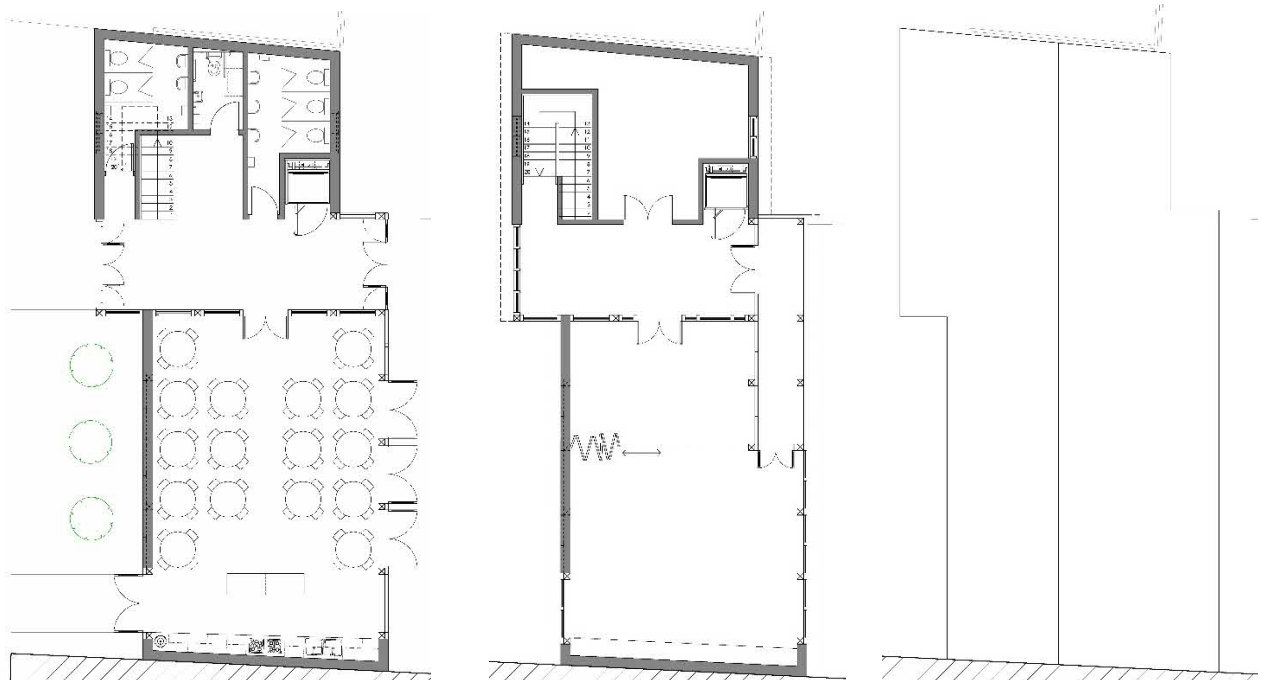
Ground Floor Plan, First Floor Plan and Roof Plan (left to right)
